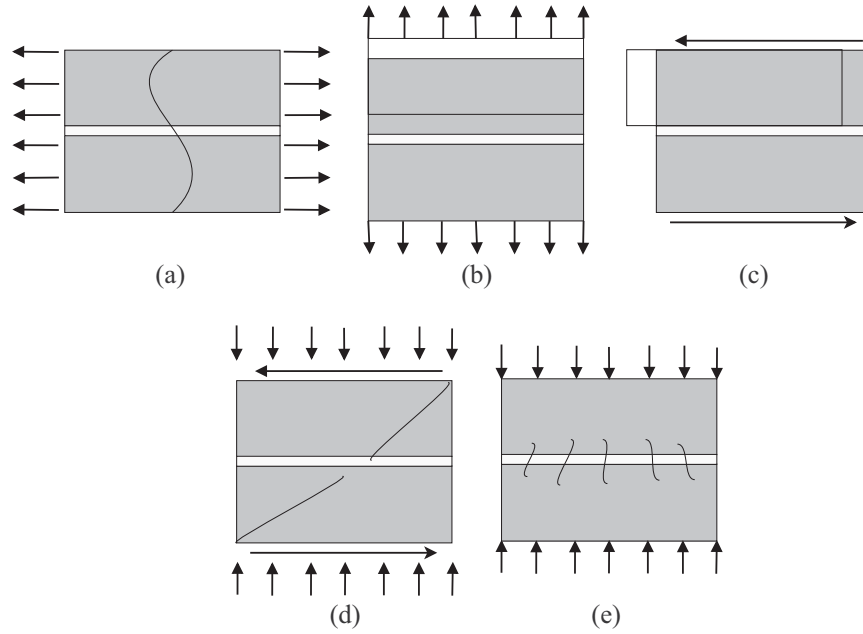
Prominent masonry failure mechanisms: (a) unit direct tensile cracking; (b) joint tensile cracking; (c) joint slipping; (d) unit diagonal tensile cracking; (e) masonry crushing.
